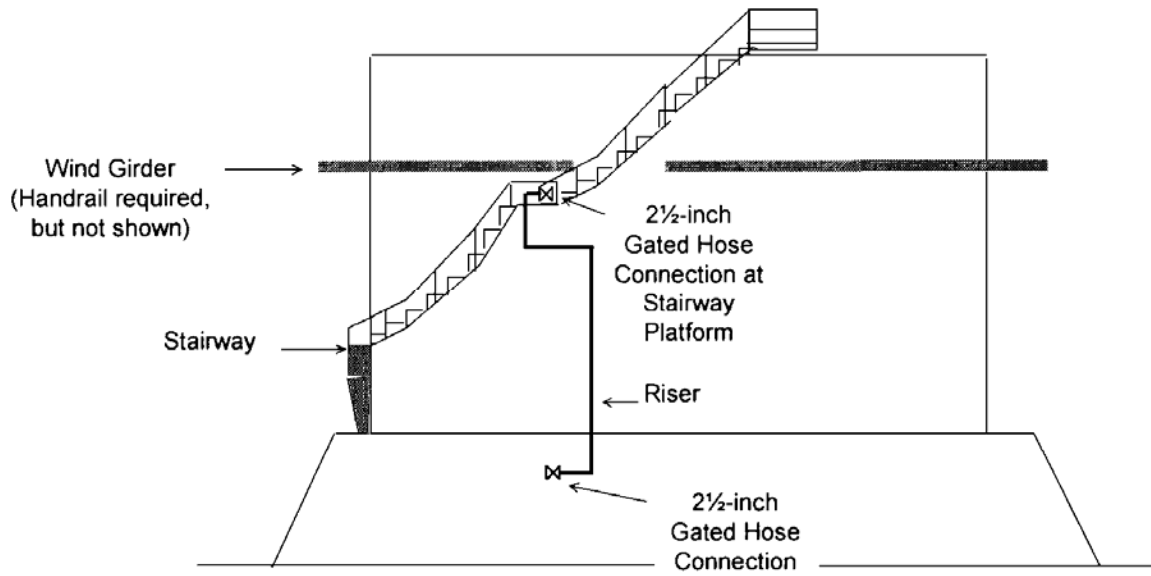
Layout of Riser with 2 1/2-Inch Hose Connections (see 7.2)
